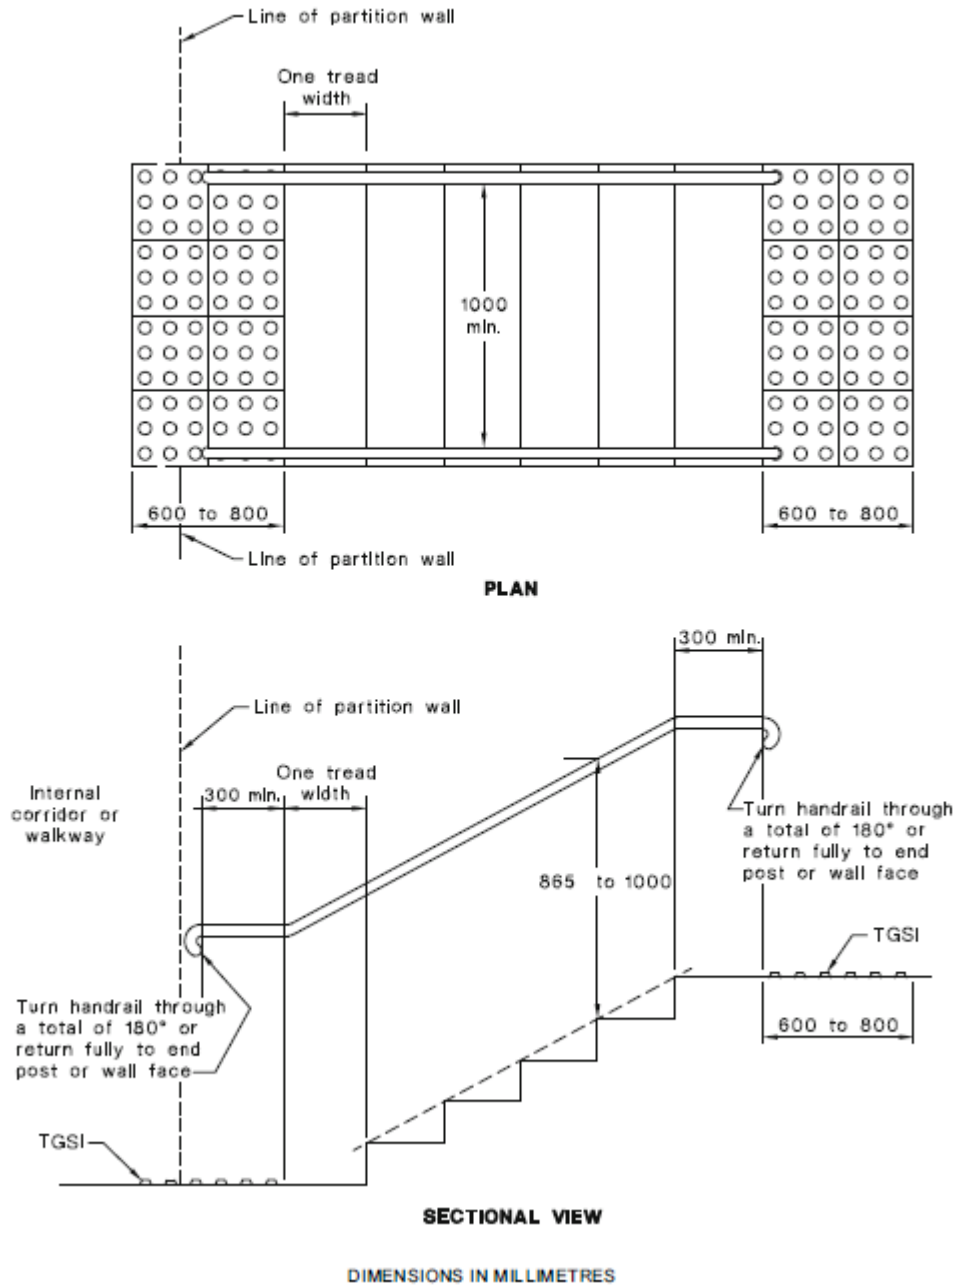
Stairway location and handrail extensions at end of stairway other than at line of boundary
